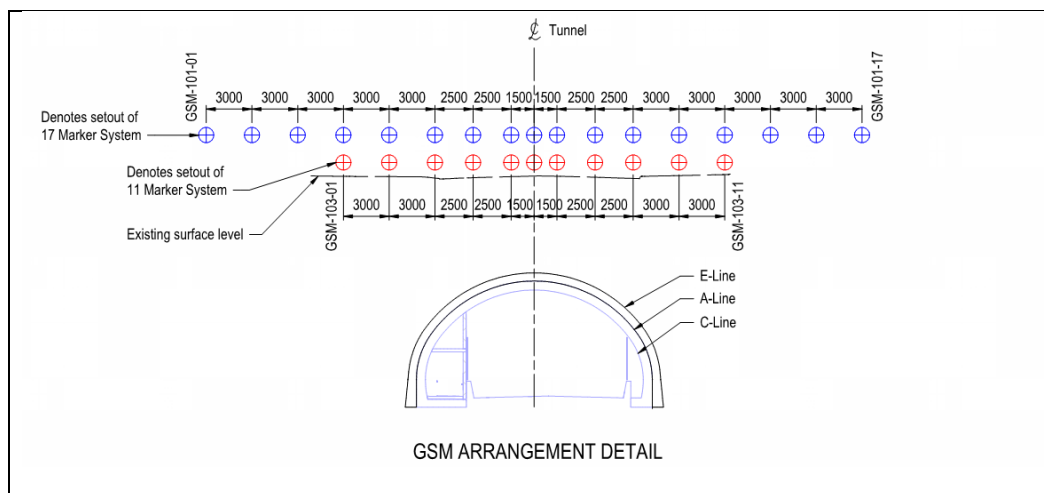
Typical GSM settlement array layout (from I&M Plan).
